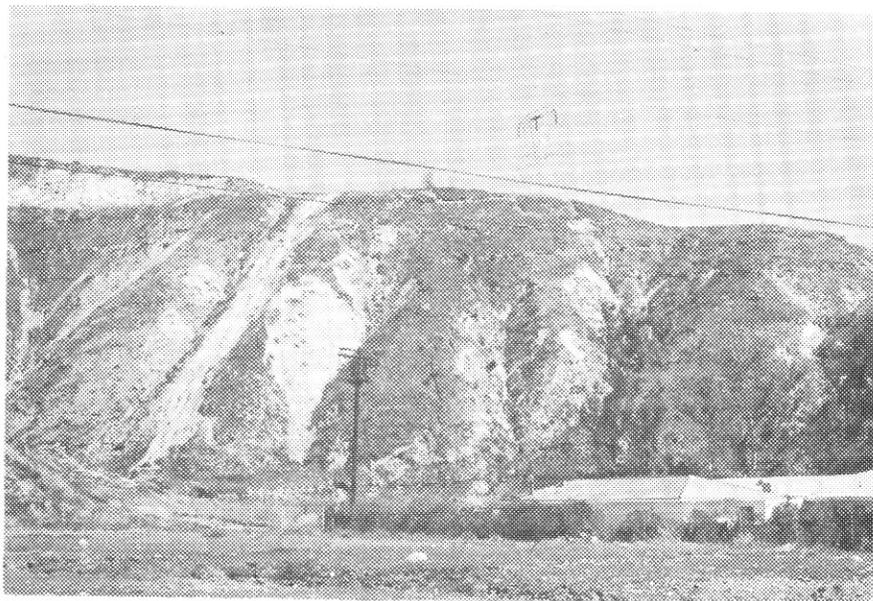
Looking northeasterly at planned site of Route 210/118 Interchange.
